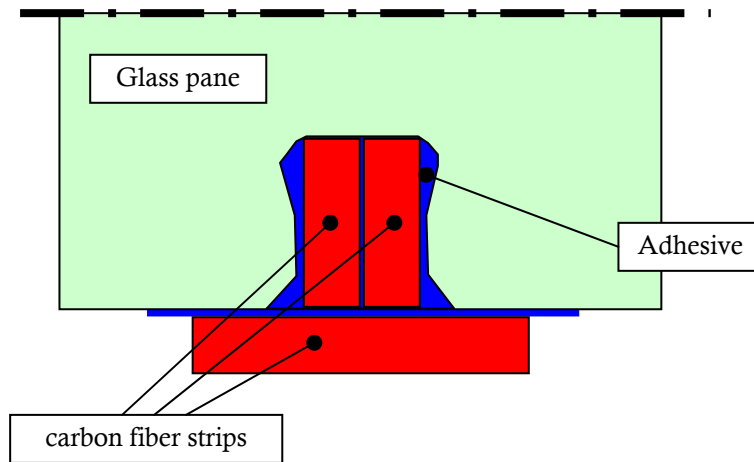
, Close-up of bottom of girder cross-section with reinforcement geometry for specimen 2.
